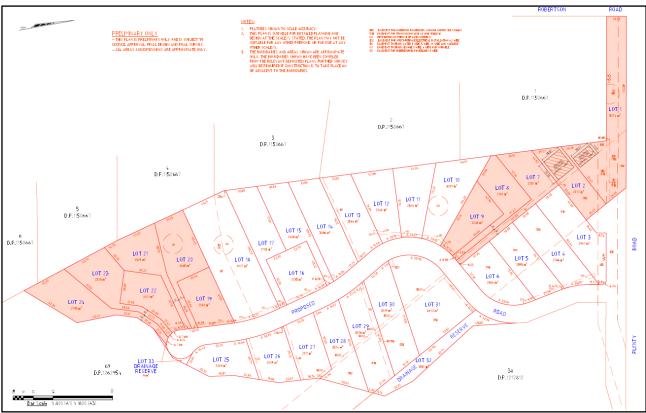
Proposed Subdivision Plan – Addition of four new lots resulting in modifications to those lots shown in orange.
